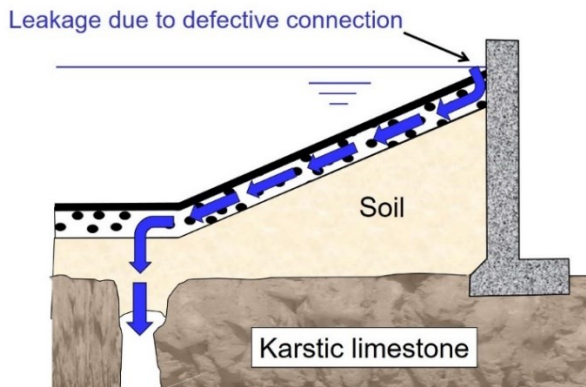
Leakage at a defective connection between the geomembrane and a concrete structure and flow of water in the leakage collection and detection layer.
